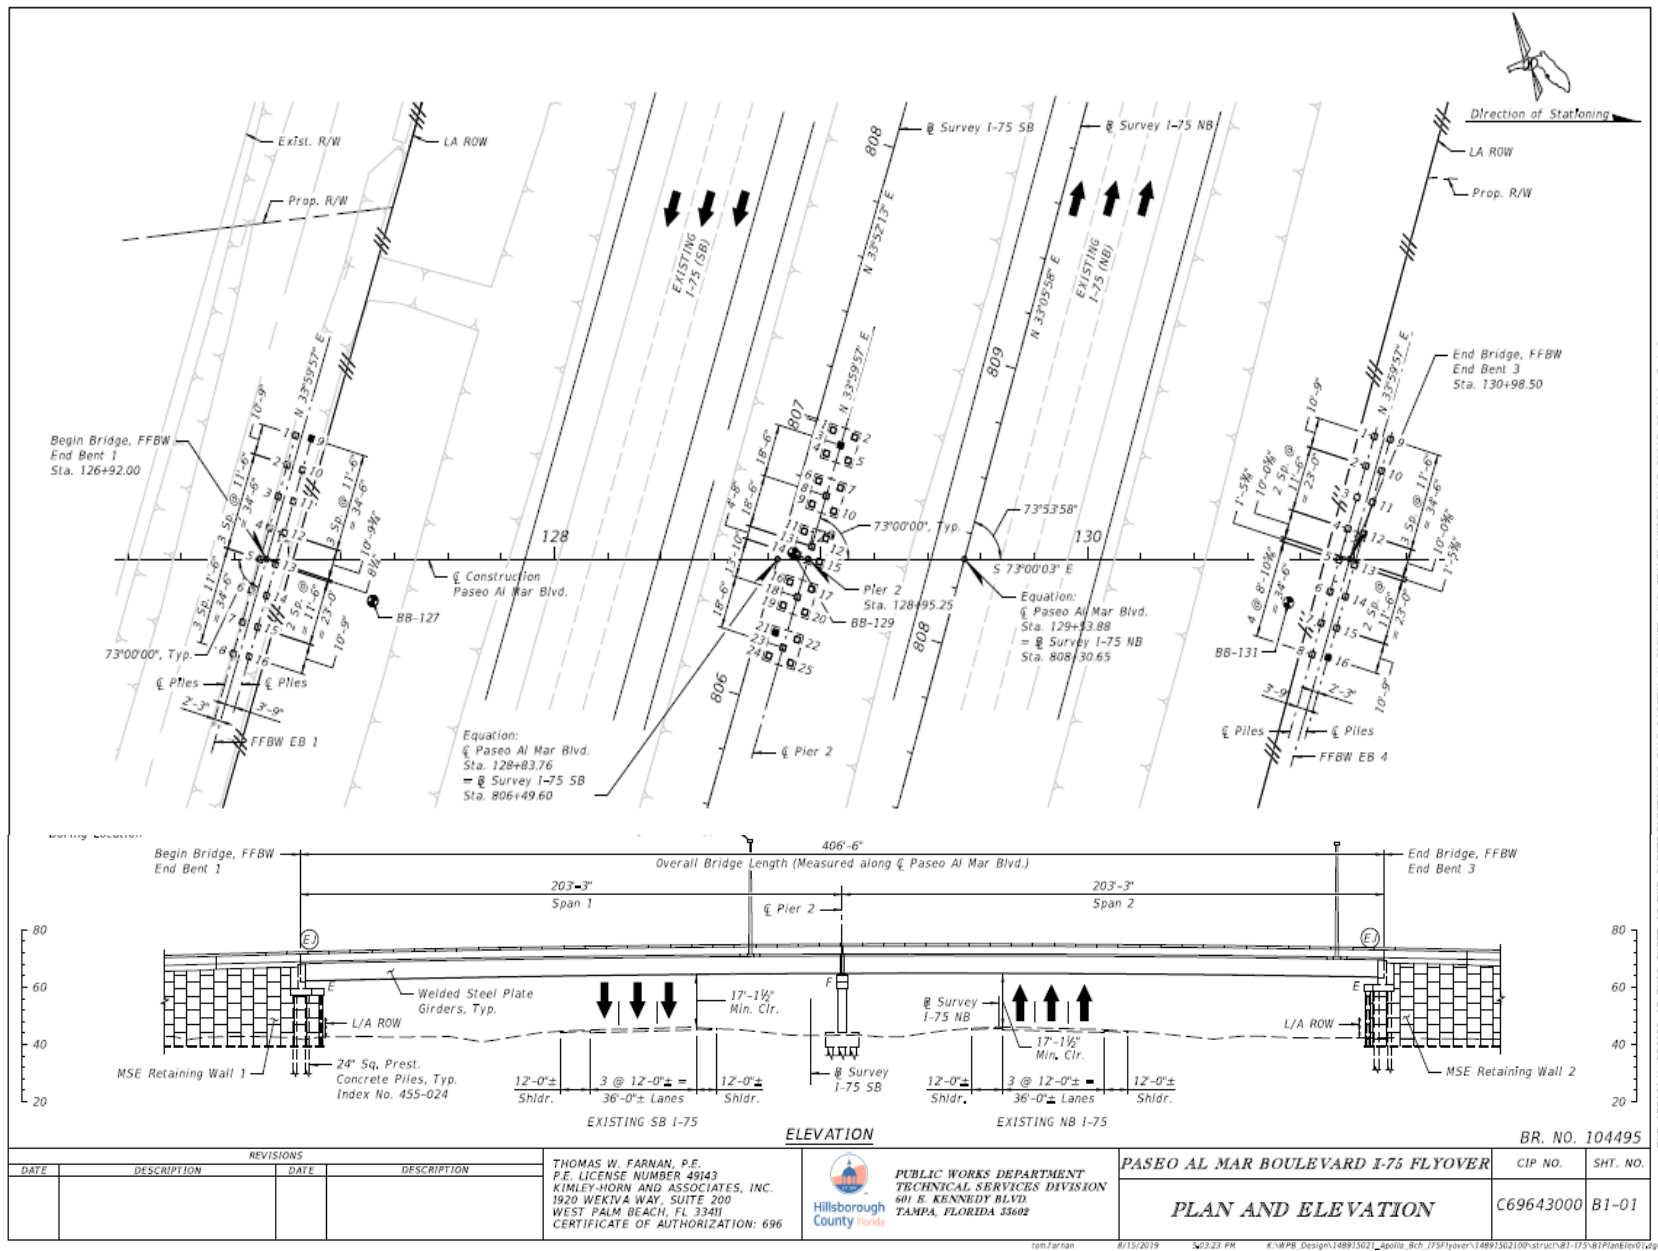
Foundation layout for Bridge No.104495 (Paseo Al Mar Blvd)
